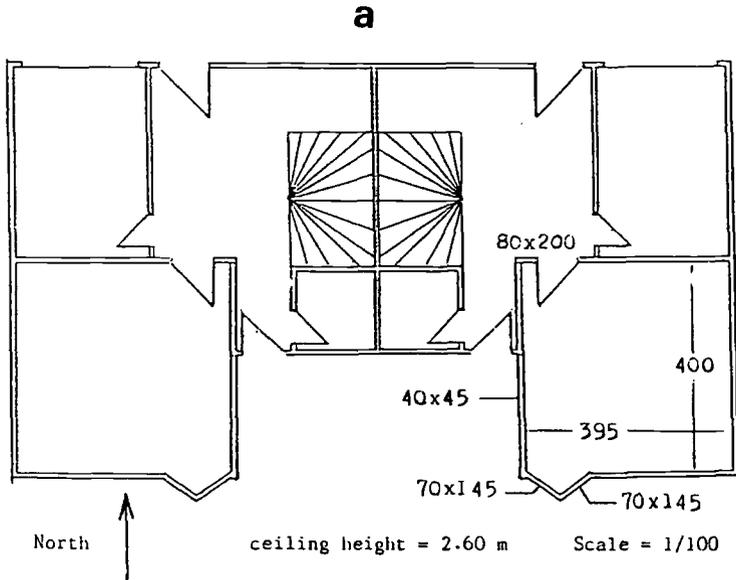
Bottom floor plan of the three-story dwelling in the second site.
